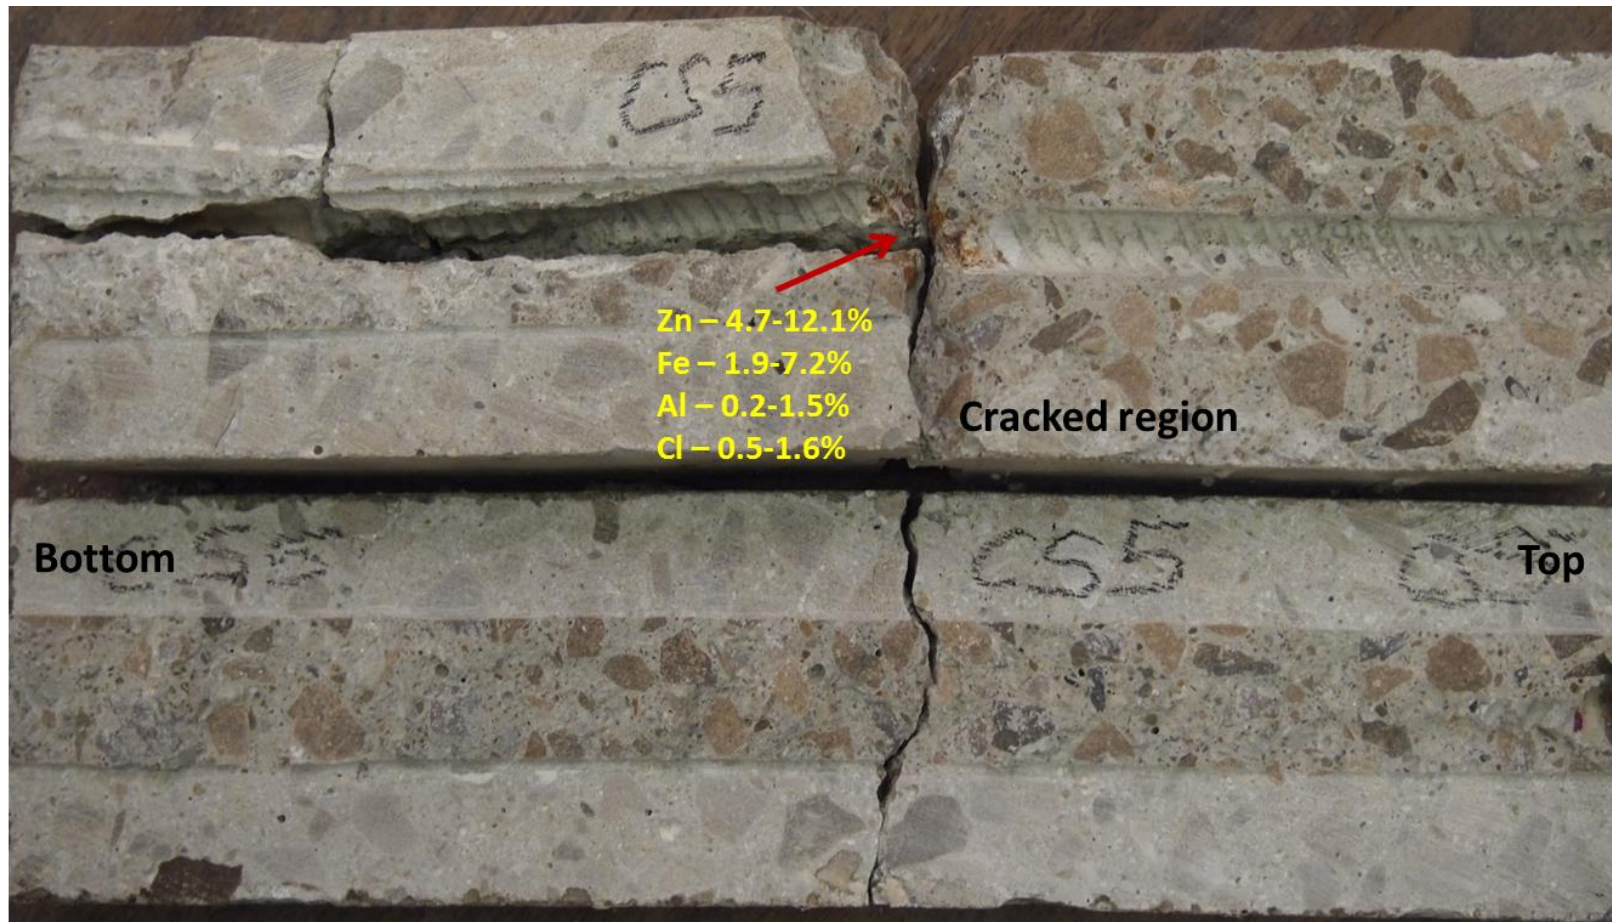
XRF analysis of autopsied transversely cracked C2 concrete specimen
